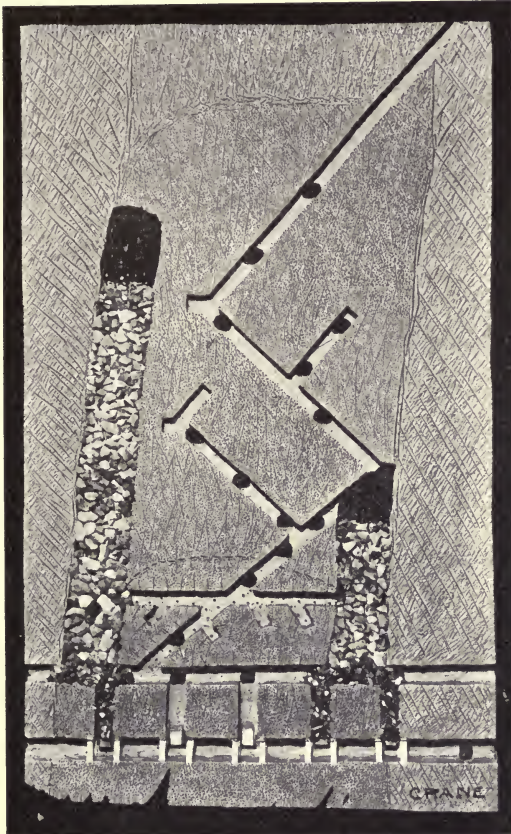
Vertical Section through Pillar Showing Development Passages and Chutes for Drawing off Ore. (Modeled after Sketch by T. D. Tallant.)
